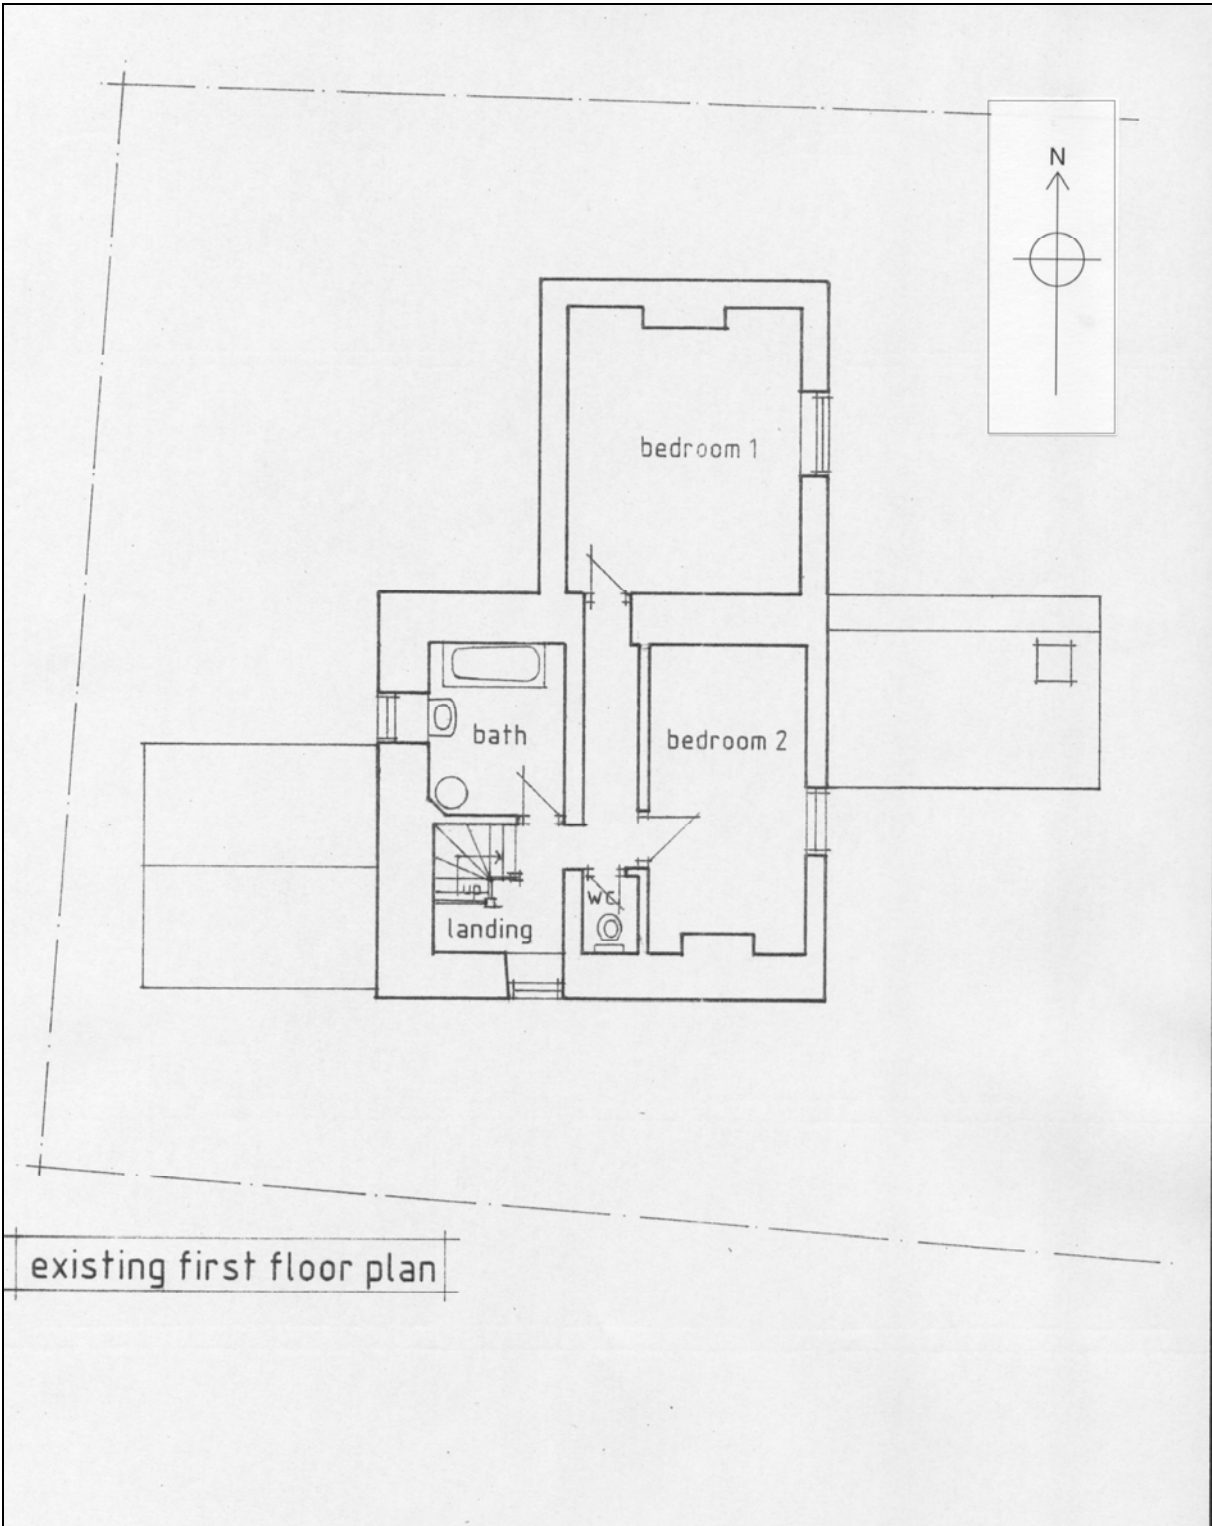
Existing First Floor Plan. Extract from Building Plan Services drawing HP3253/a/1 (not to scale).
